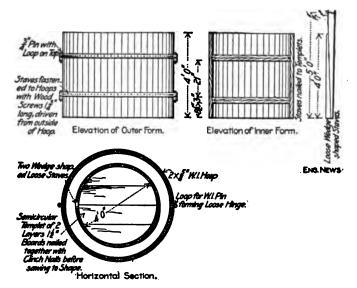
Forms for Molding Reinforced Concrete Culvert Pipe.
